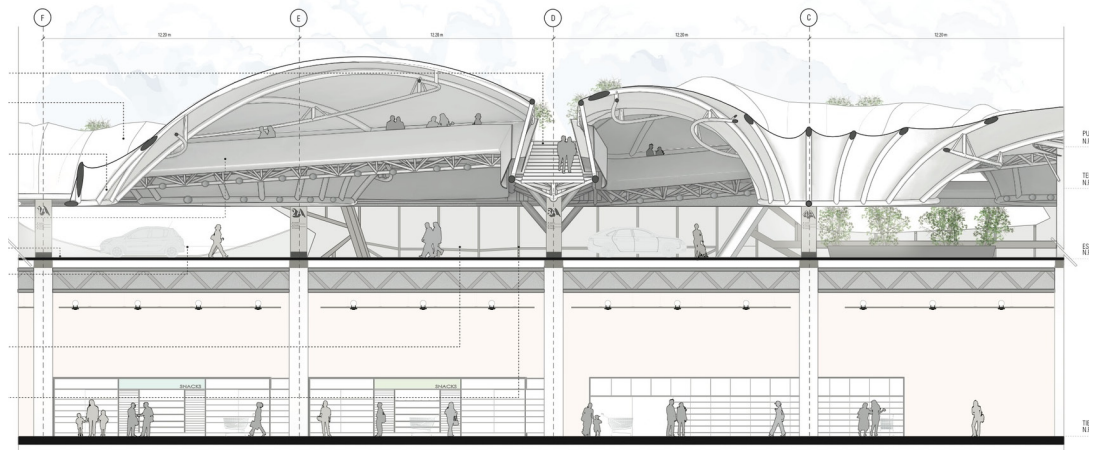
,Chedraui Supermarket Store in Santa Fe, Mexico City, section showing tensile structure detailing
